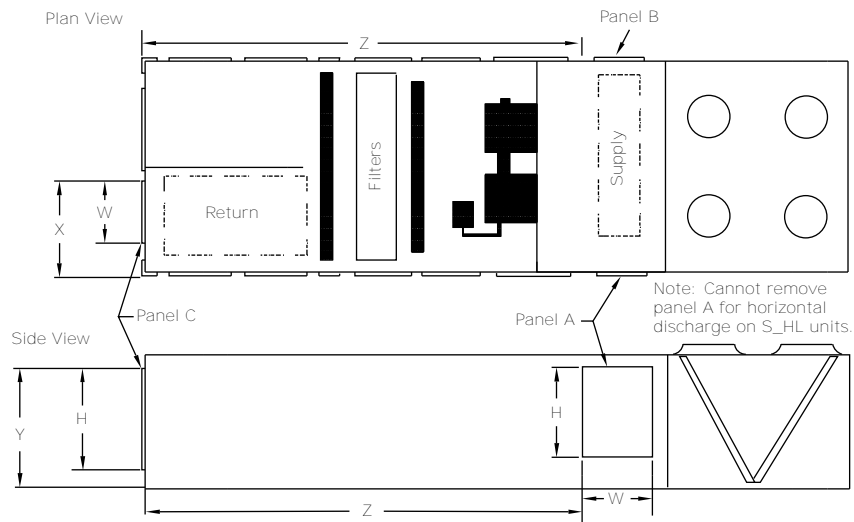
, p. 11](#) is a simplified sketch of the rooftop showing which panels can be used for horizontal supply and/or return. To supply air horizontally, the panels that normally house the heat accessory controls (Panel A) and the gas heat barometric dampers (Panel B) can be removed
